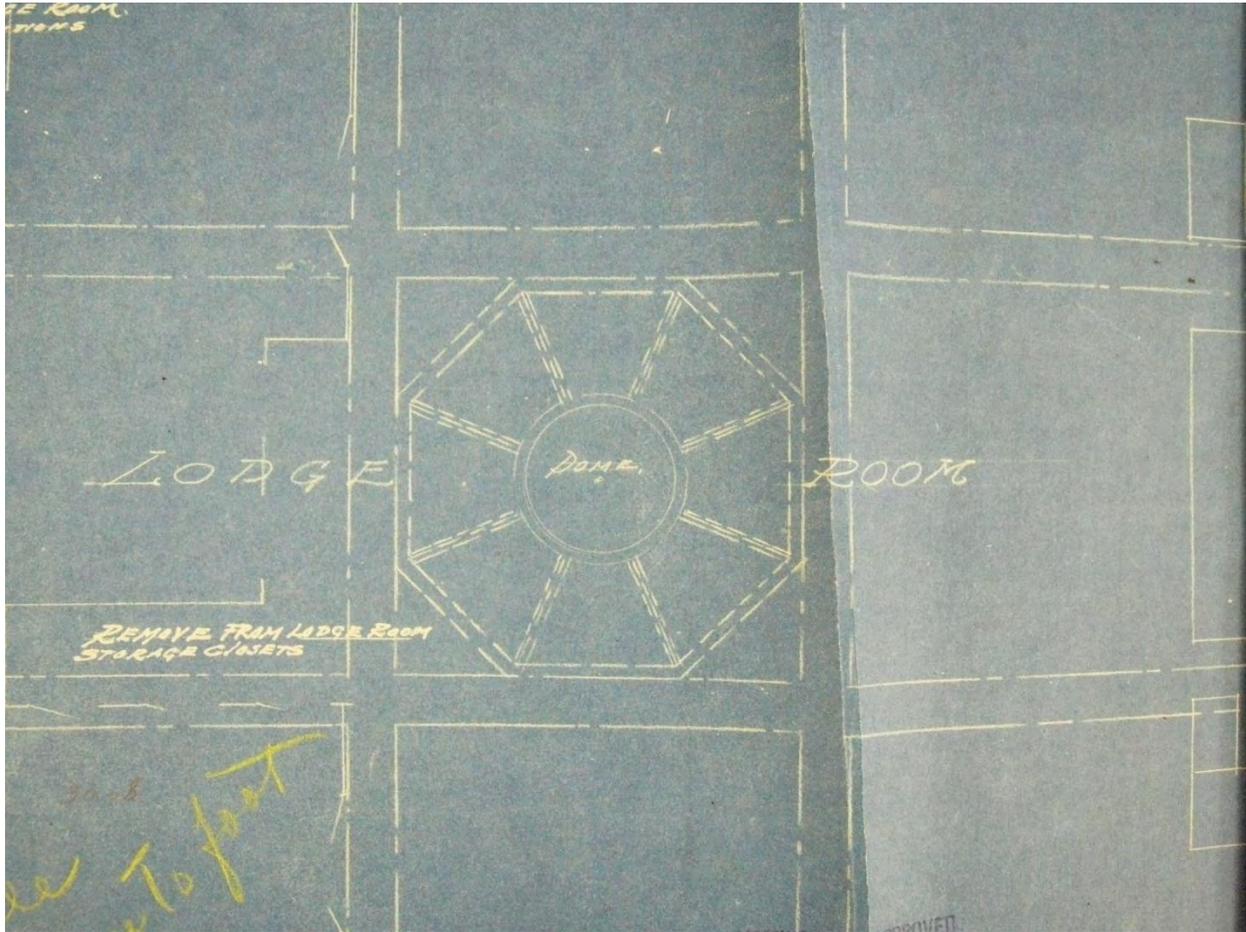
Second floor lodge / dance hall detail of the oculus in the 1910 building, from Haley's drawing set, source: Northwest Architectural Archives
